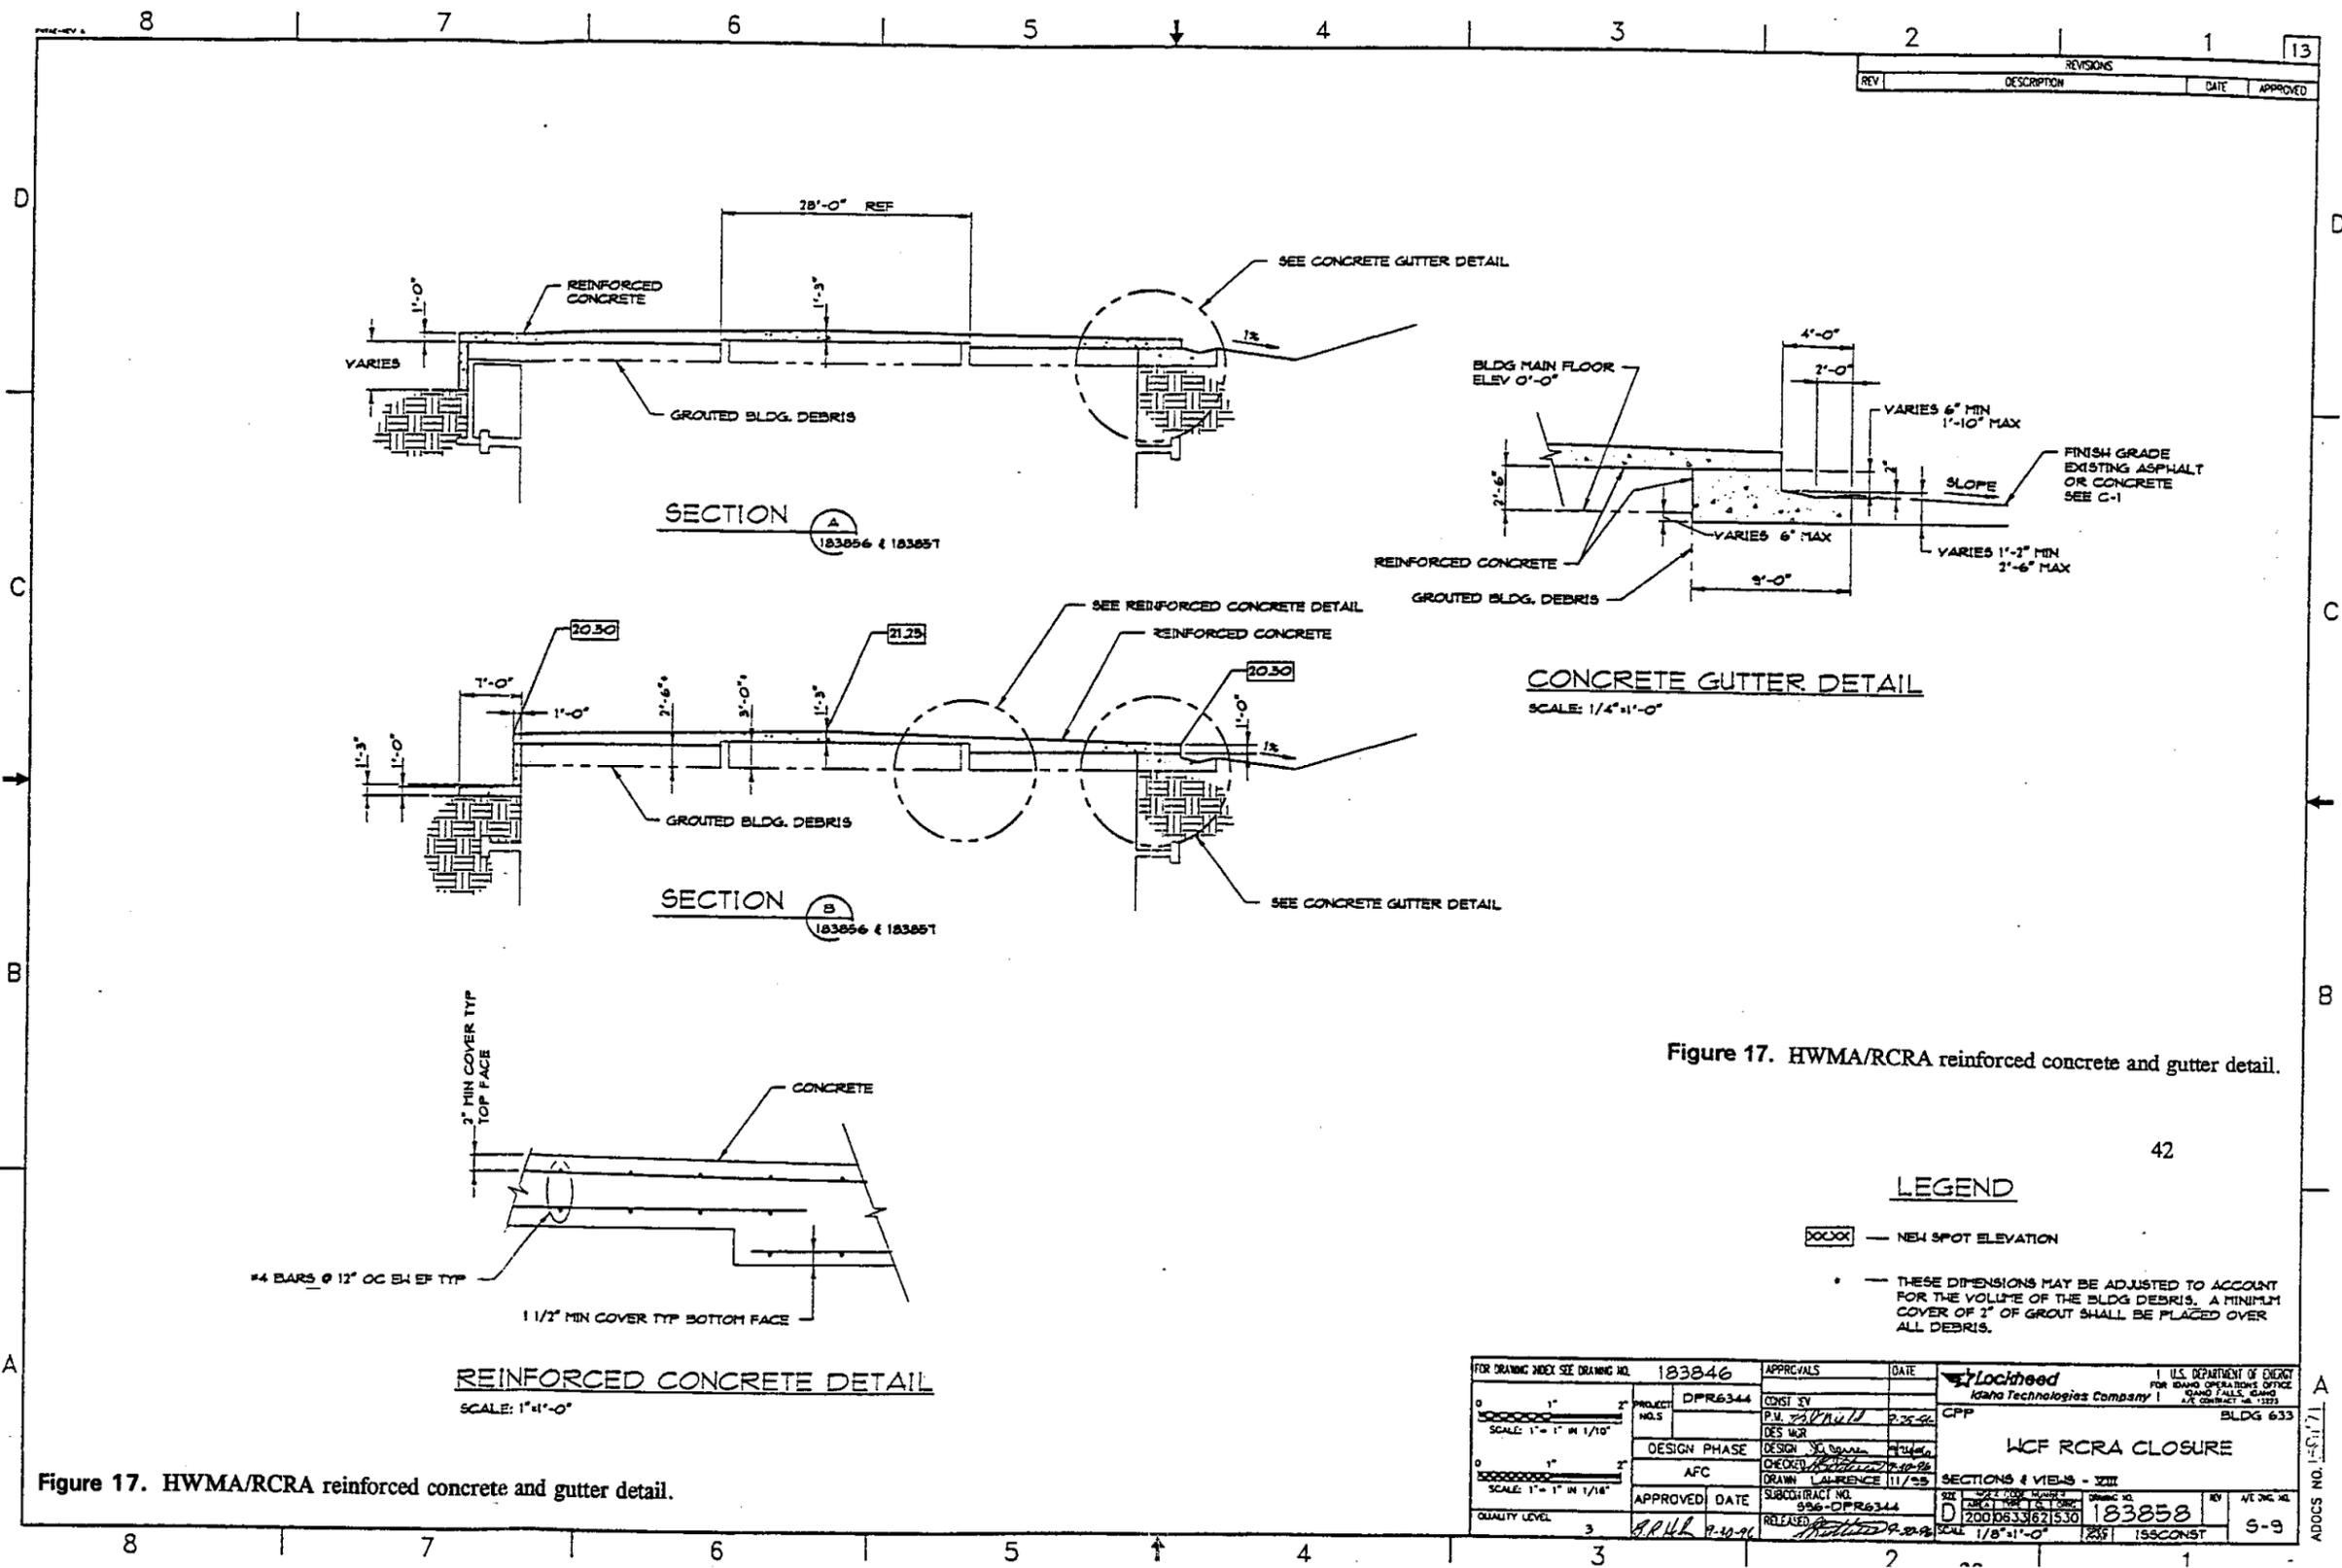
HWMA/RCRA reinforced concrete and gutter detail.
